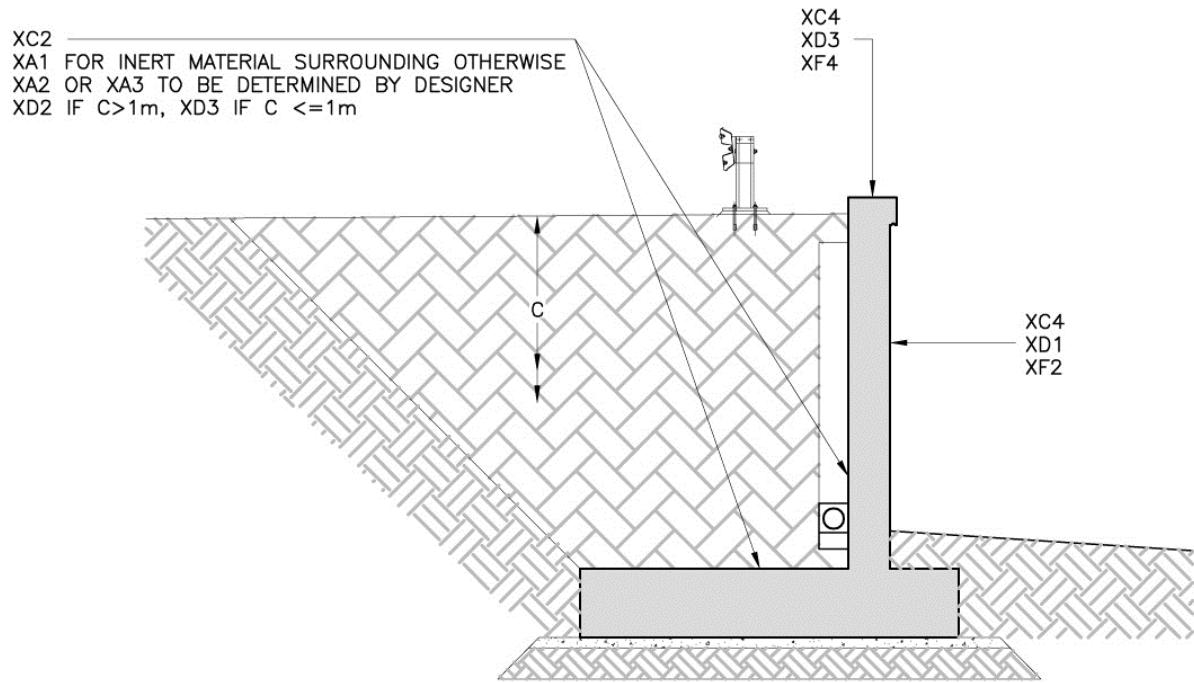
Wingwall / Retaining Wall (Road Over only)
